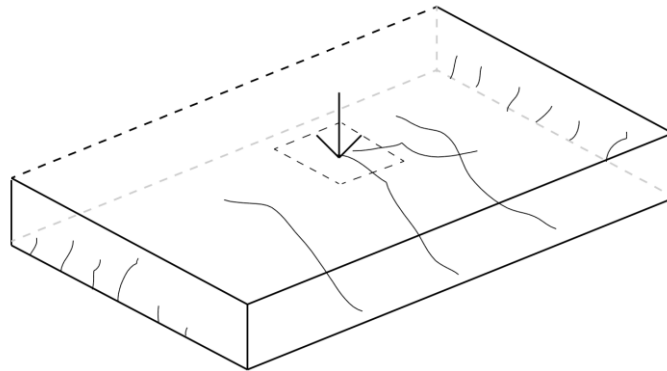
Assumed three-dimensional cracking pattern for shear failure – wide beam shear failure (Lantsoght, 2013)
